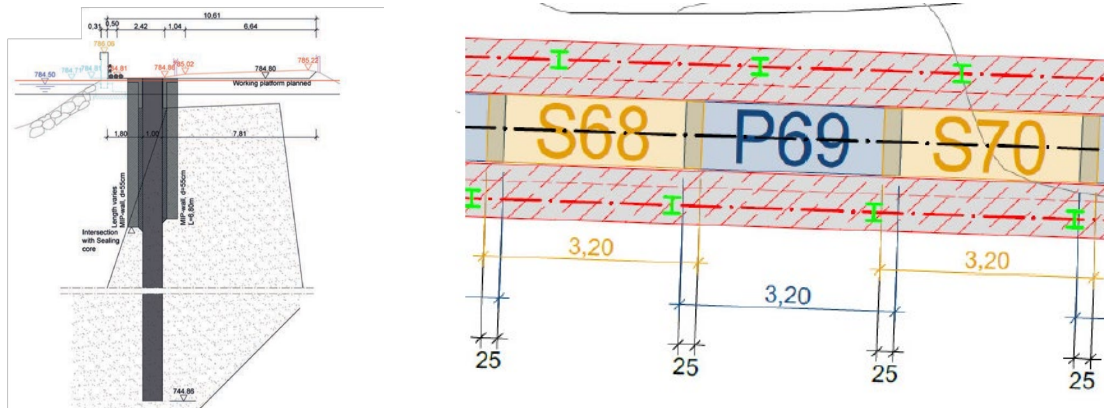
Standard cross section regarding the Mixed-in-Place walls and diaphragm wall
